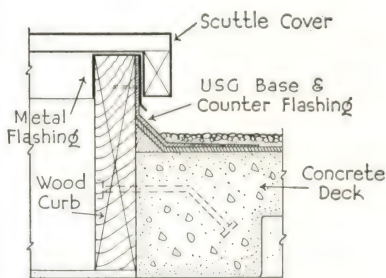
DETAILS OF ENDS AND EAVES OF VARIOUS TYPES OF ROOF DECKS
